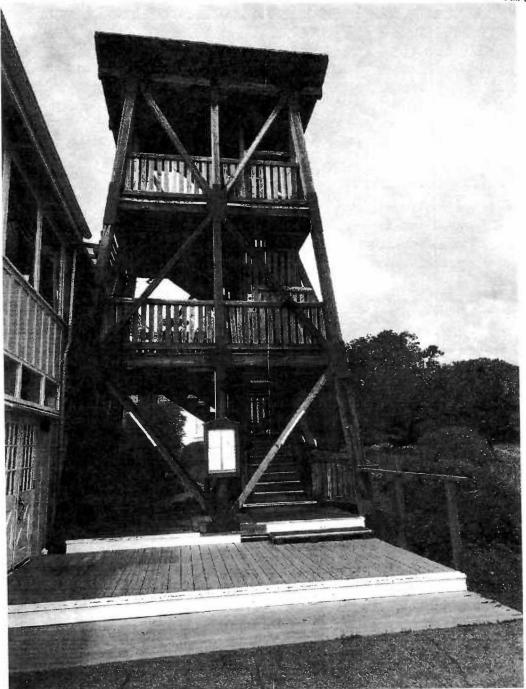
SOUTH ELEVATION OF WATER TOWER BUILDING Showing ground floor= Level 1, Level 2, Level 3 and roof=Level 4
